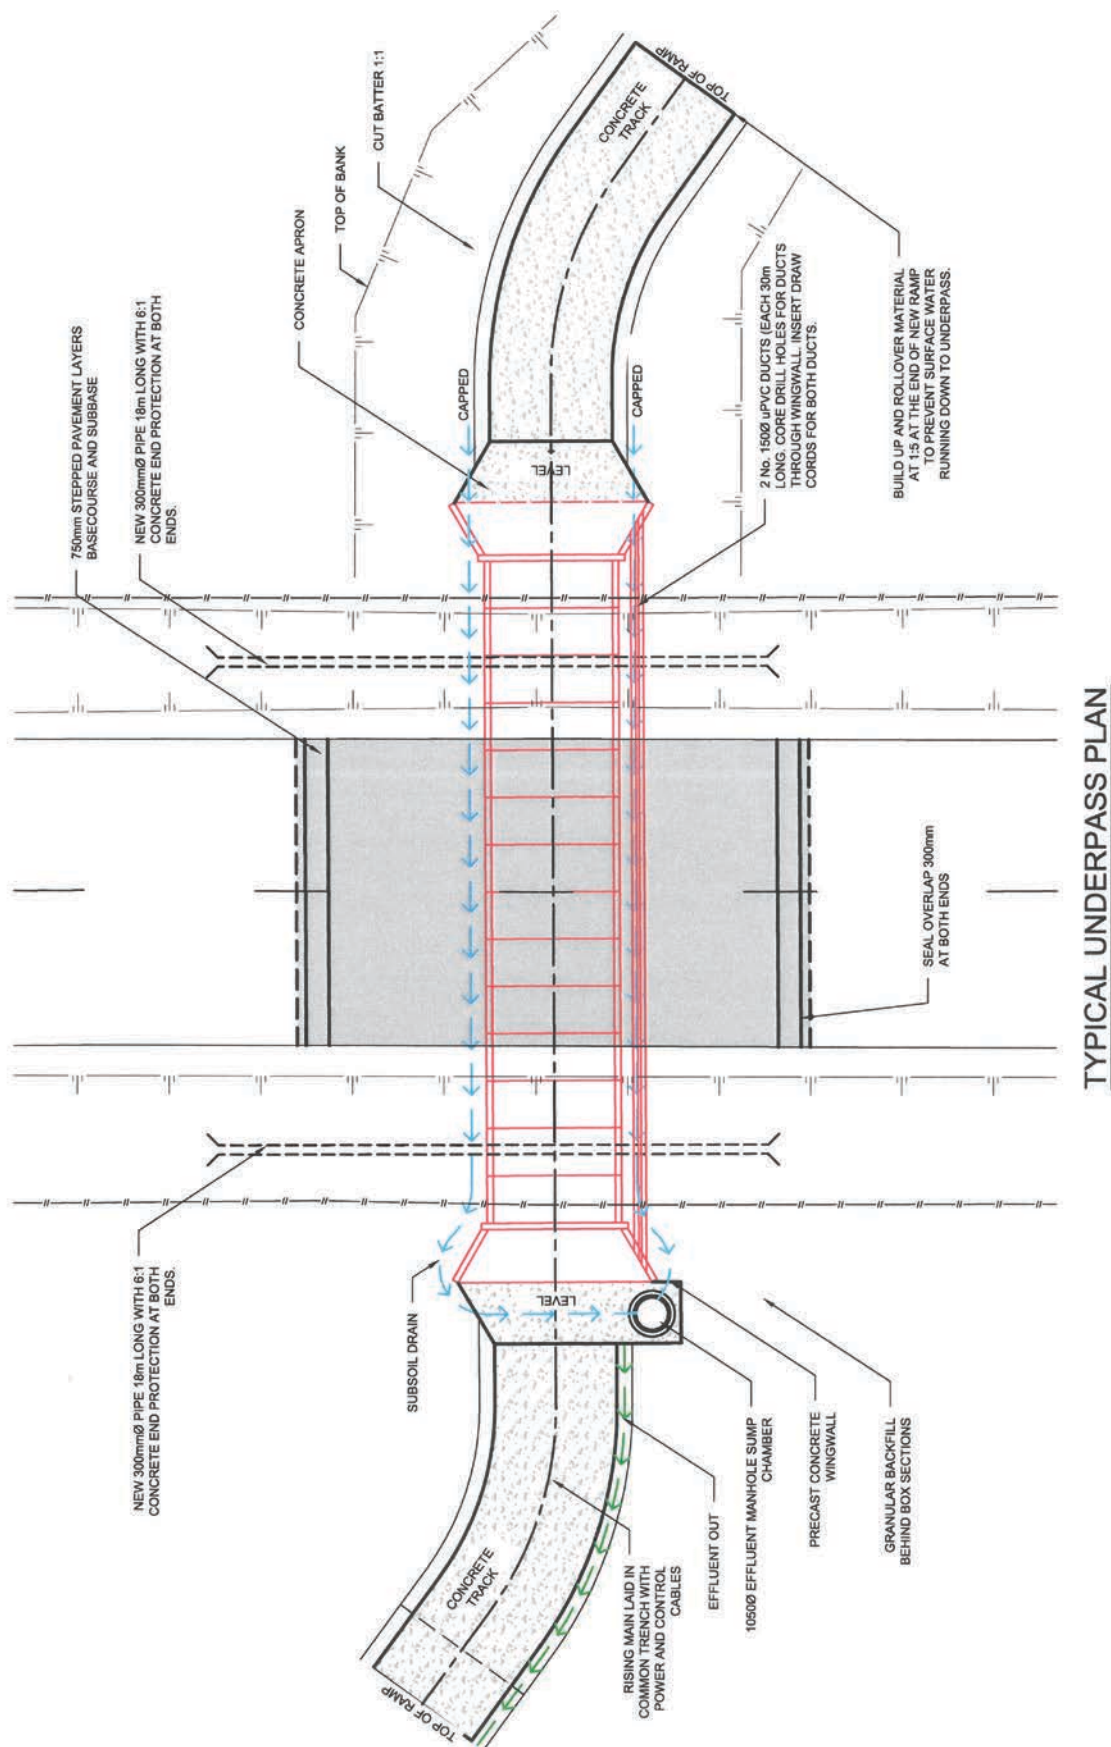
Example Design for an Underpass beneath an Existing Bridge
